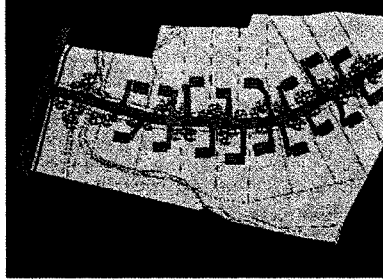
Site plan for the traditional development at Jordan Cove.
